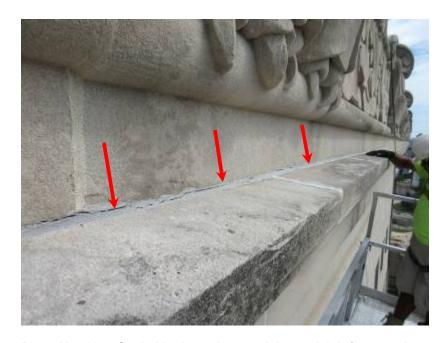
Sealed horizontal mortar joint at eighth floor cornice.
